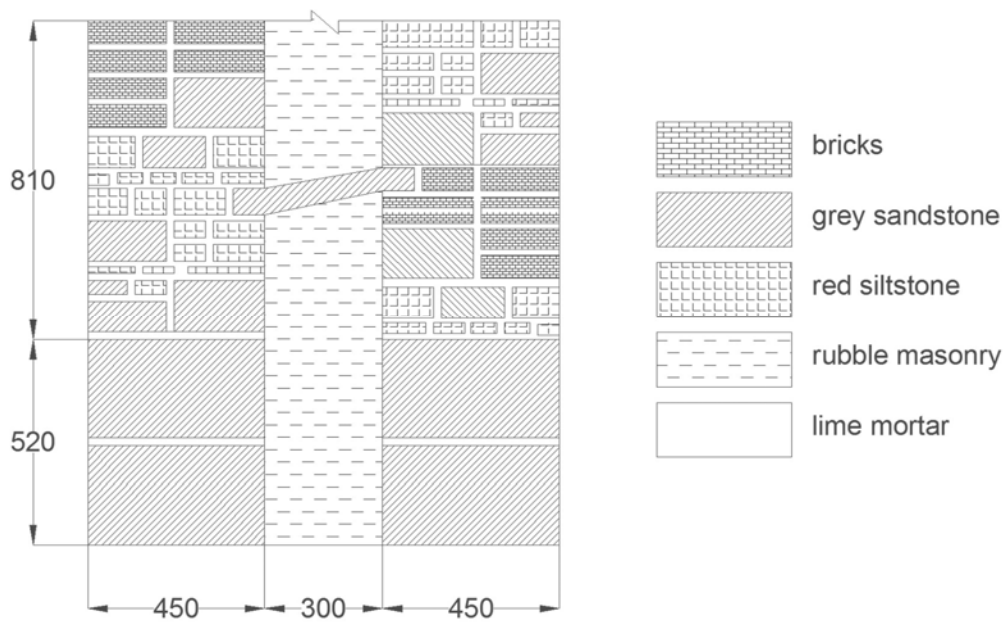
Sectional wall configuration 4 with connecting stones and legend
